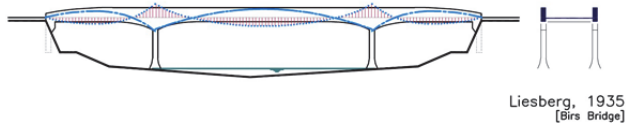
Robert Maillart's Liesberg continuous girder bridge, 1:750
